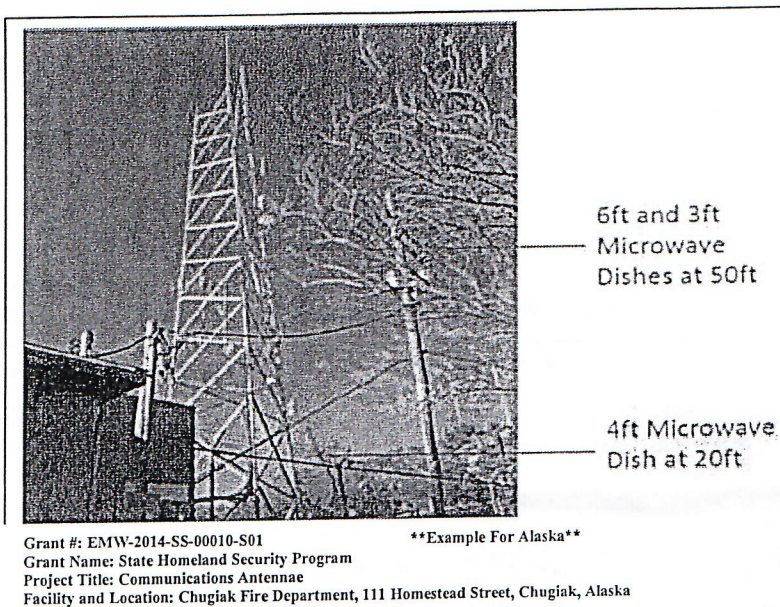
Ground-level photograph showing proposed locations of new communications equipment on an existing tower.
